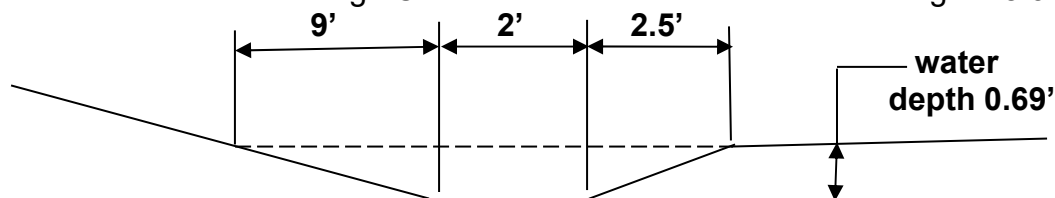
Cross-Section, Drainage Channel Section Three, 195' south, Looking North
